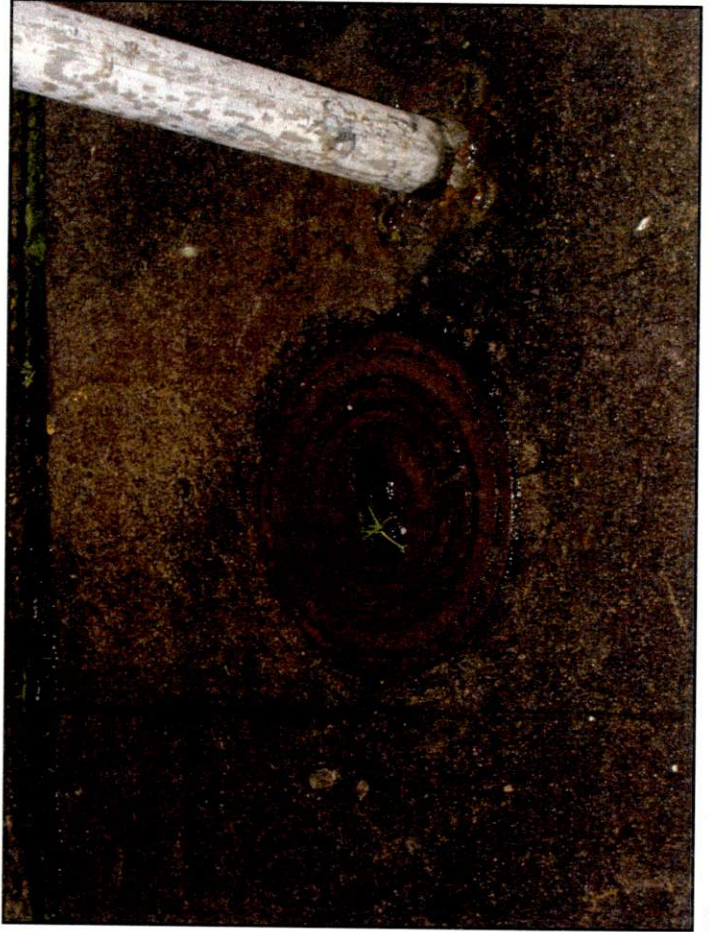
View of the underground heating oil tank manhole and piping located beneath the Exchange Street sidewalk (January 3, 2003).
